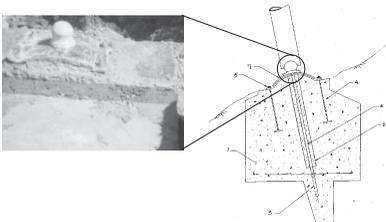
Swivel post with articulated Ball & Socket joint arrangement showing (1) concrete, (2) sleeve MS, (3) anchor bolt, (4) foundation - bolt, (5) nut & washer (6) resin, and (7) base plate.
